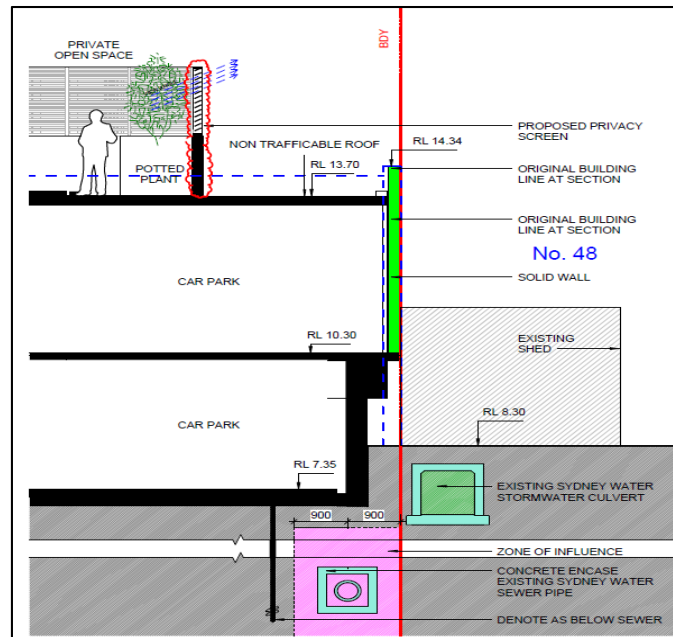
Type C fence along the southern boundary (section view adjoining 48 Miles Street)
